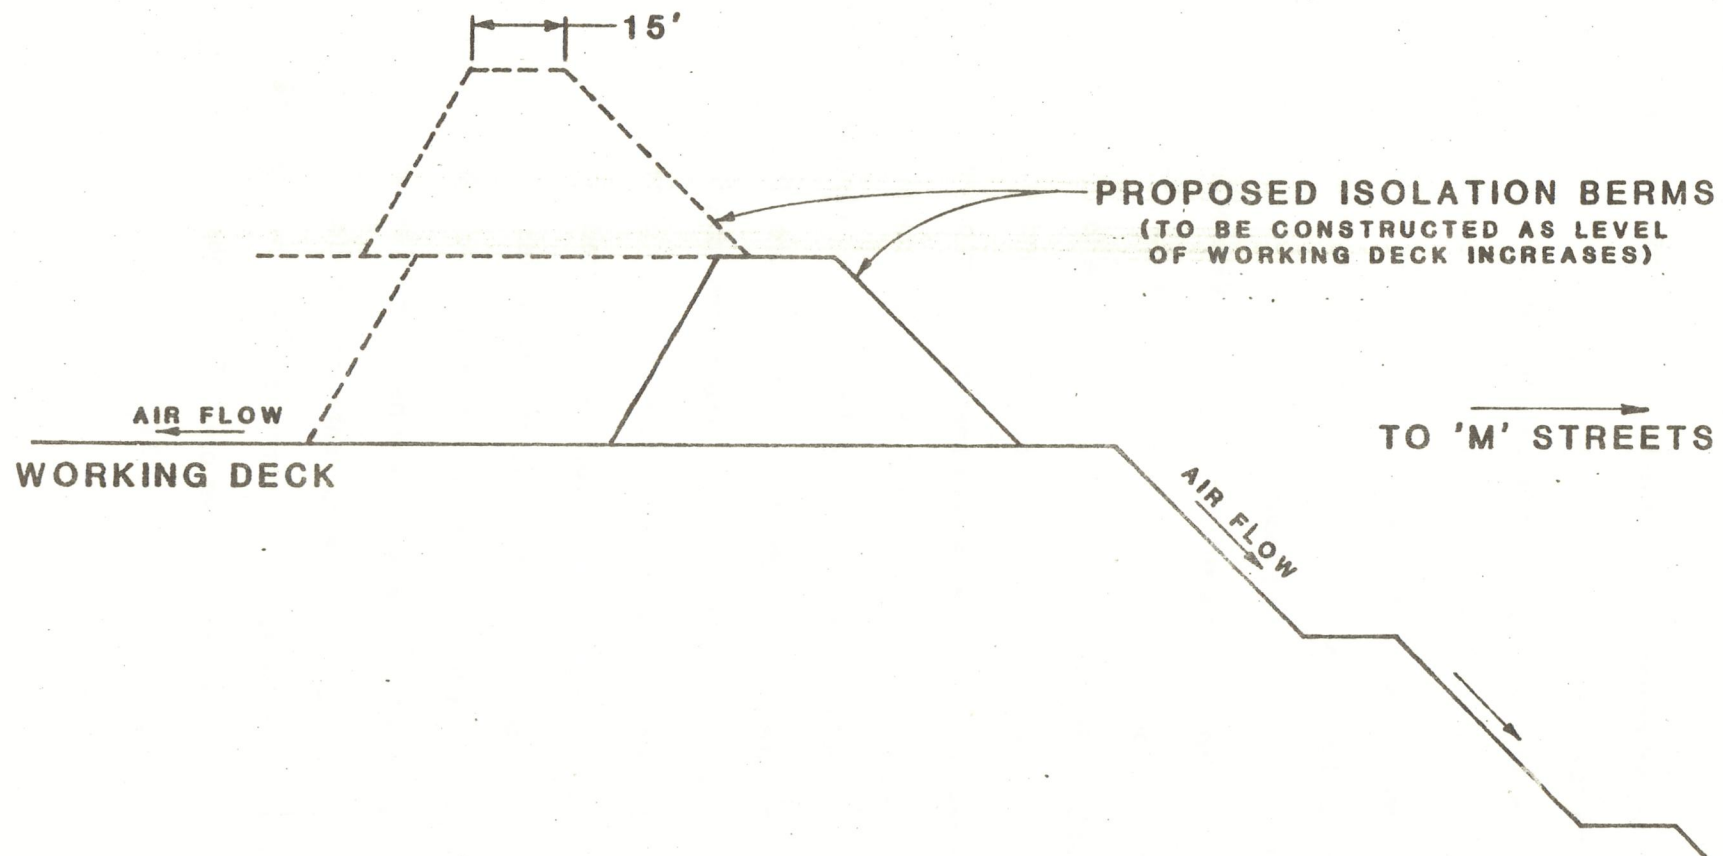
PROPOSED BERMS FOR 'M' STREET AREA
